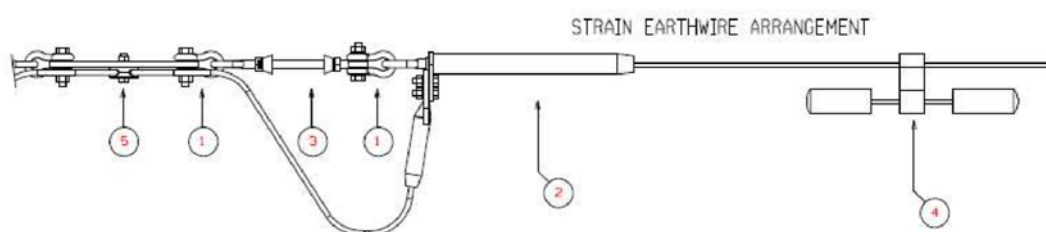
(Non-Insulated Option) Shield Wire Strain Assembly for Single “conductor”
